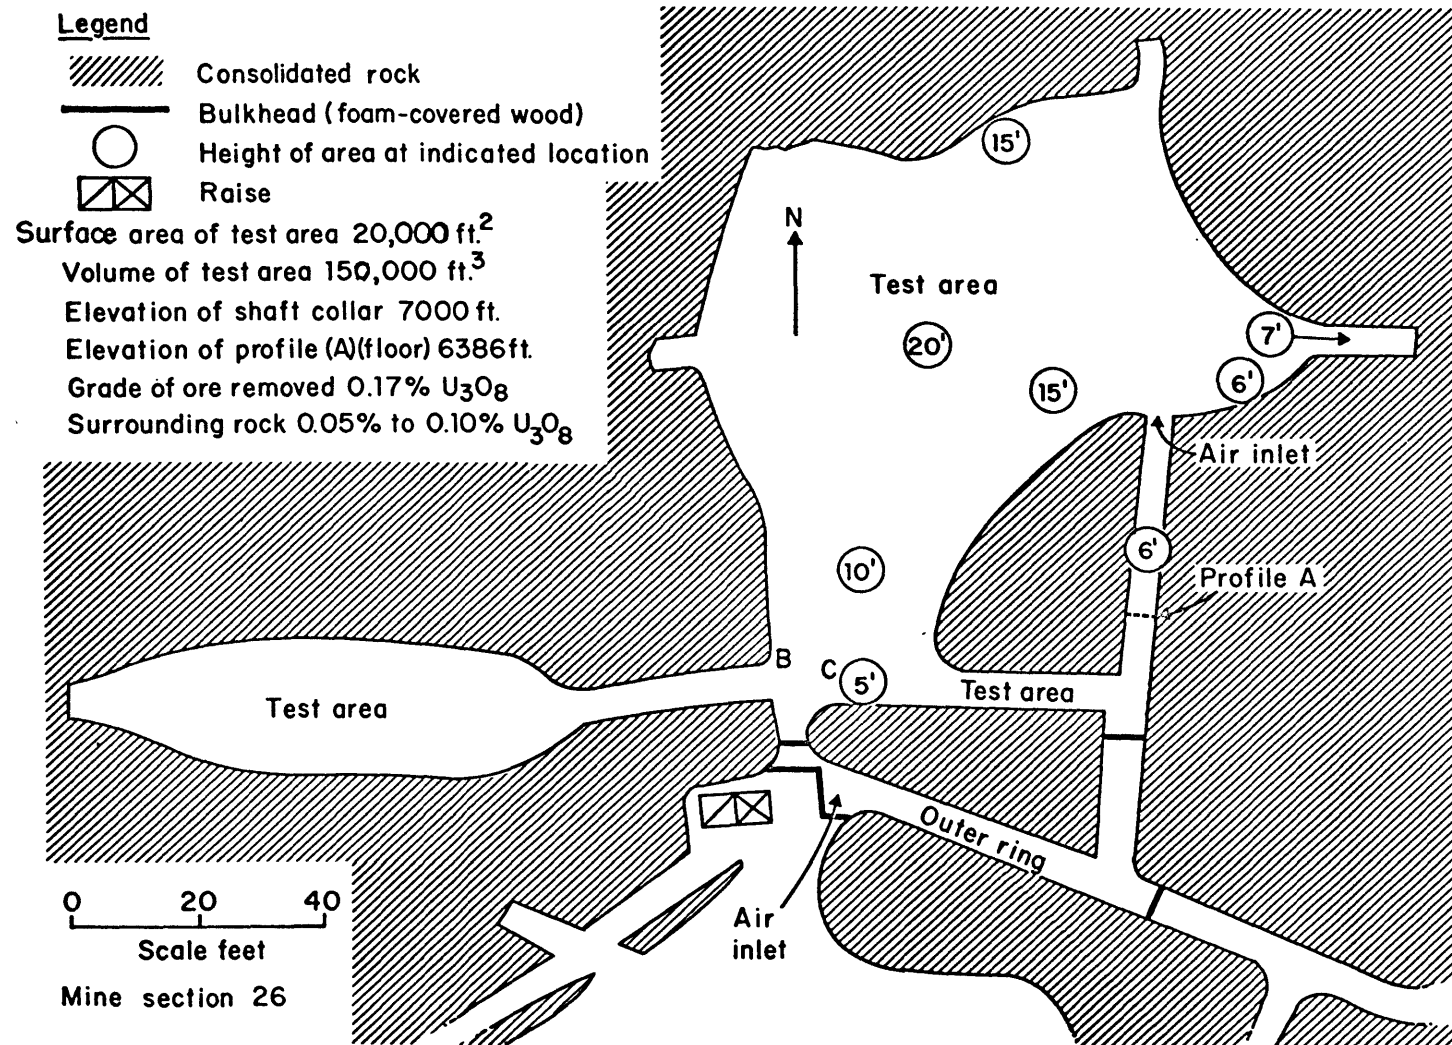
PLAN VIEW OF 5702 TEST AREA
